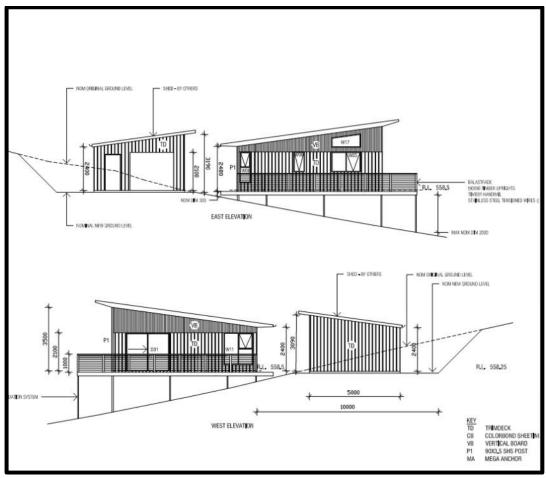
East and west elevations of proposed garage and outbuilding, showing the site cut (Designful, 2017)
